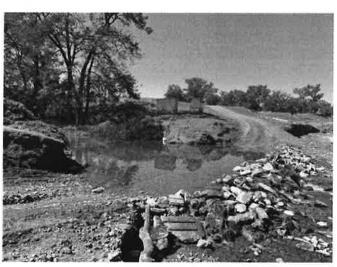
Remaining concrete southern abundements of Canomodine bridge (looking south).
